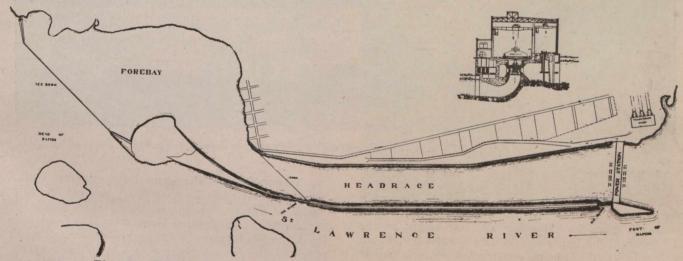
General Arrangement of Plant, and Cross Section of Power House.
